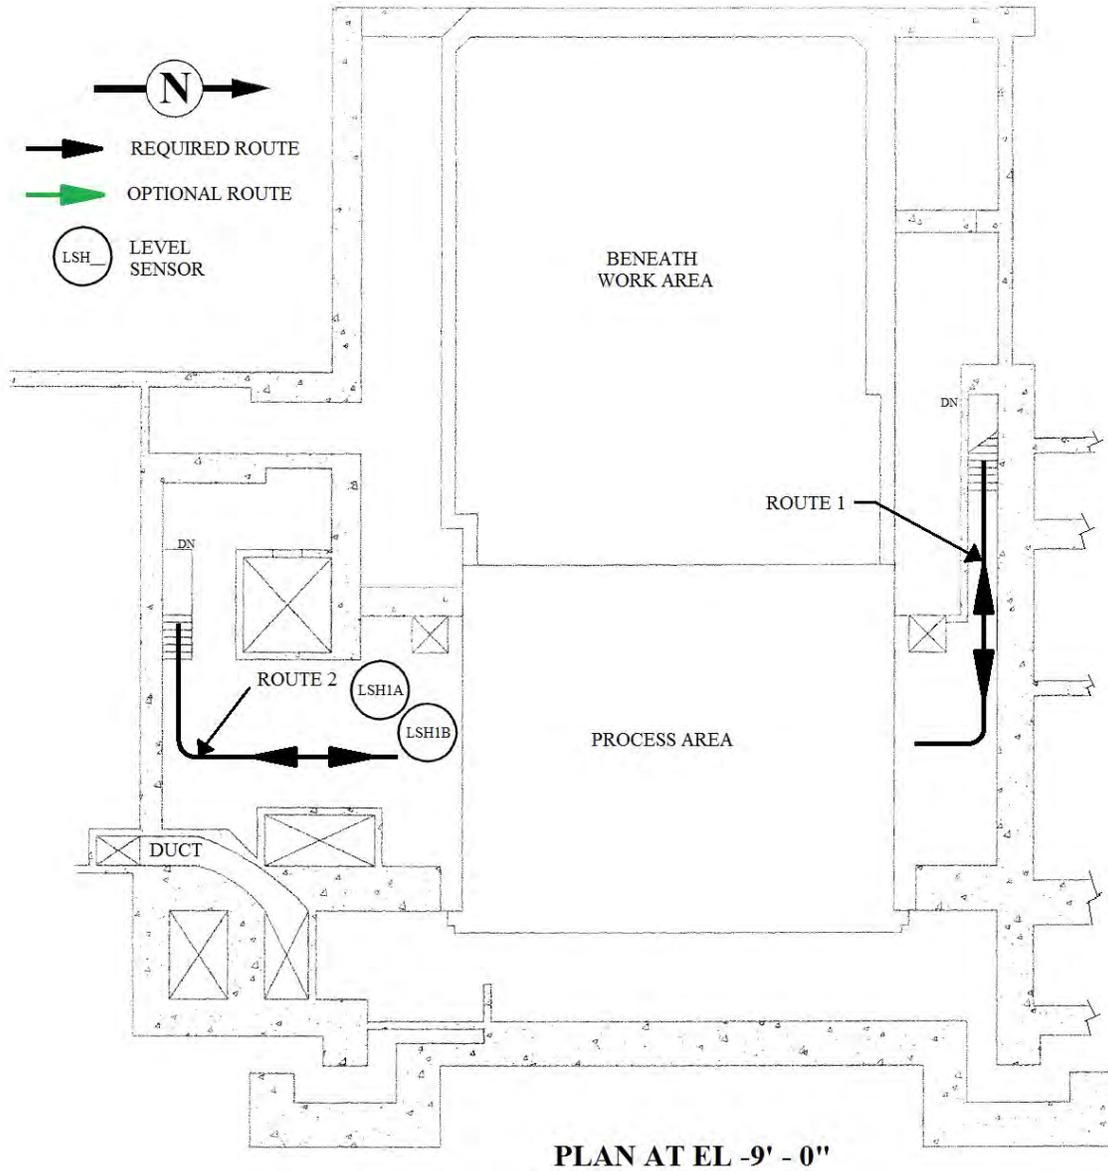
105-DR Safe Storage Enclosure Floor Plan Elevation -9 ft - 0 in.
